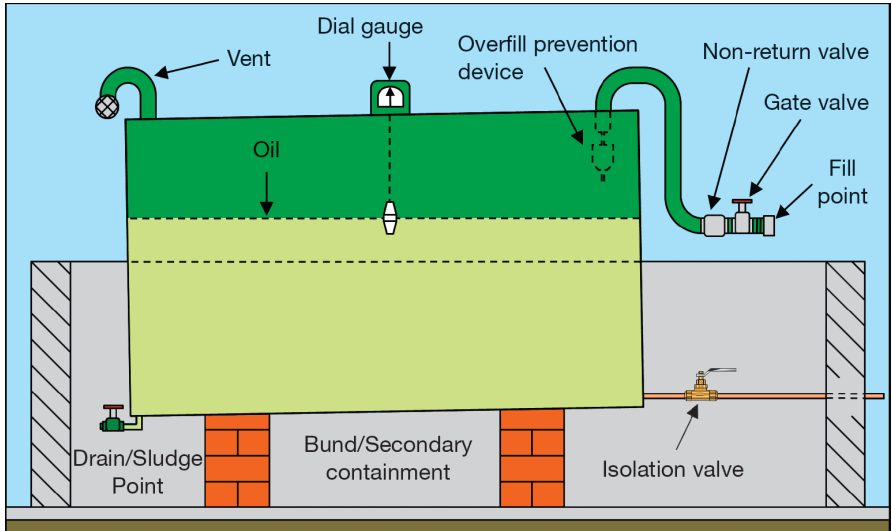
Section through a typical single-skinned steel tank with offset fill point in a concrete or masonry bund.
